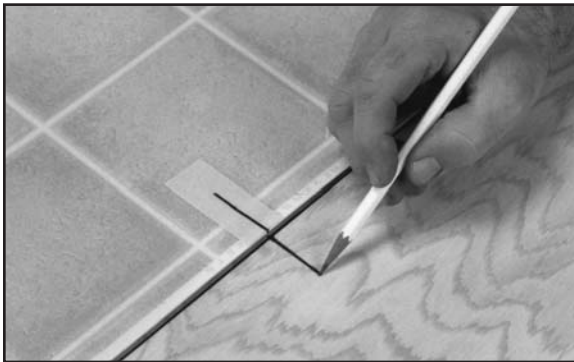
Make a perpendicular line on flooring extending onto subfloor.
